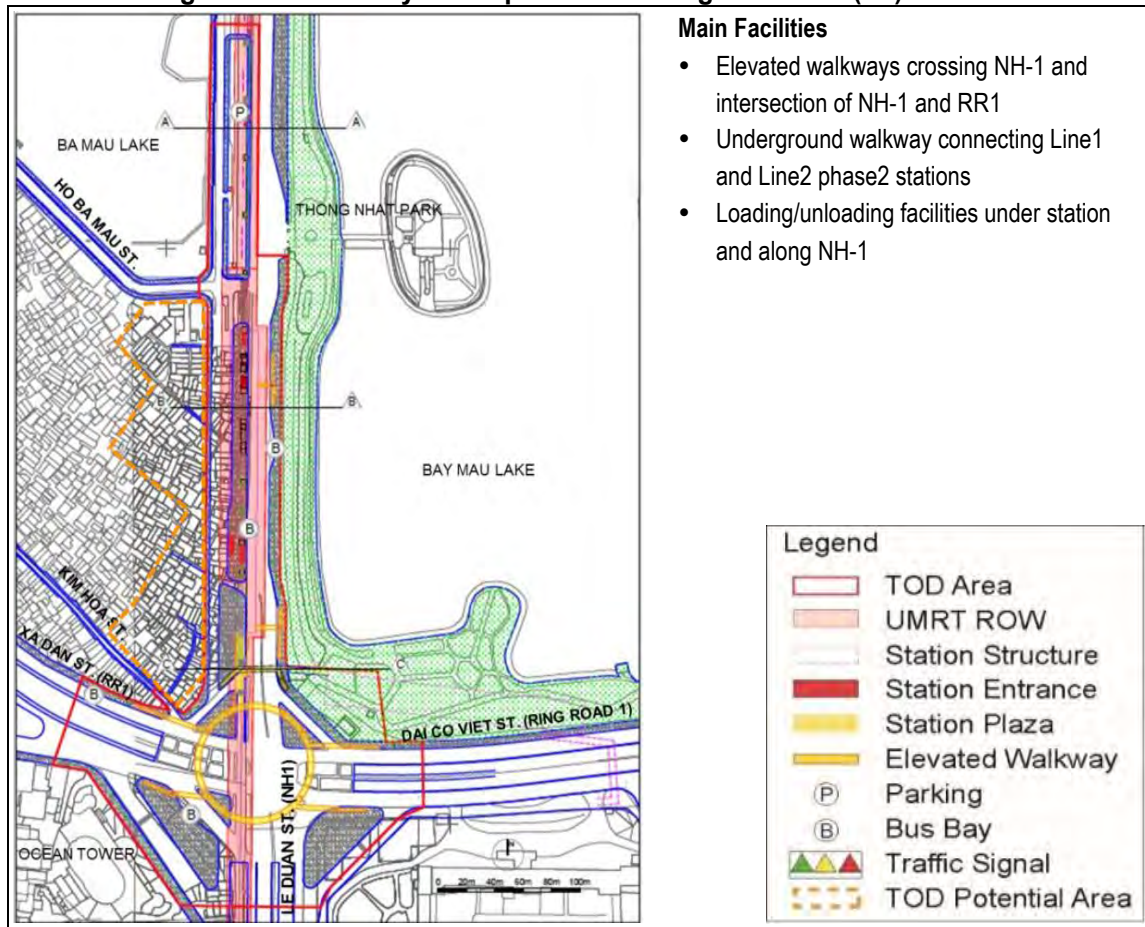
Facility Concept Plan at Thong Nhat Park (V9) Station
